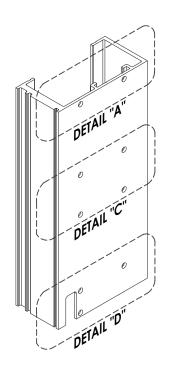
DETAIL "B" STANDARD PREP FOR EXPANSION HORIZONTAL
